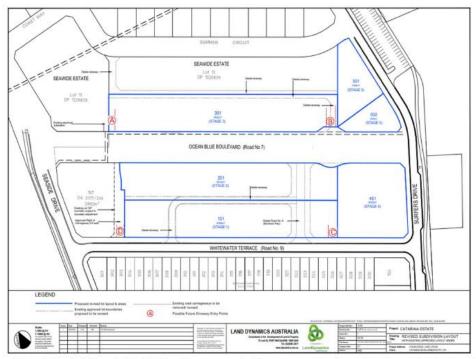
Revised Amended Subdivision Plan – removal of laneways and Bombora Way, Ocean Blue Boulevard
